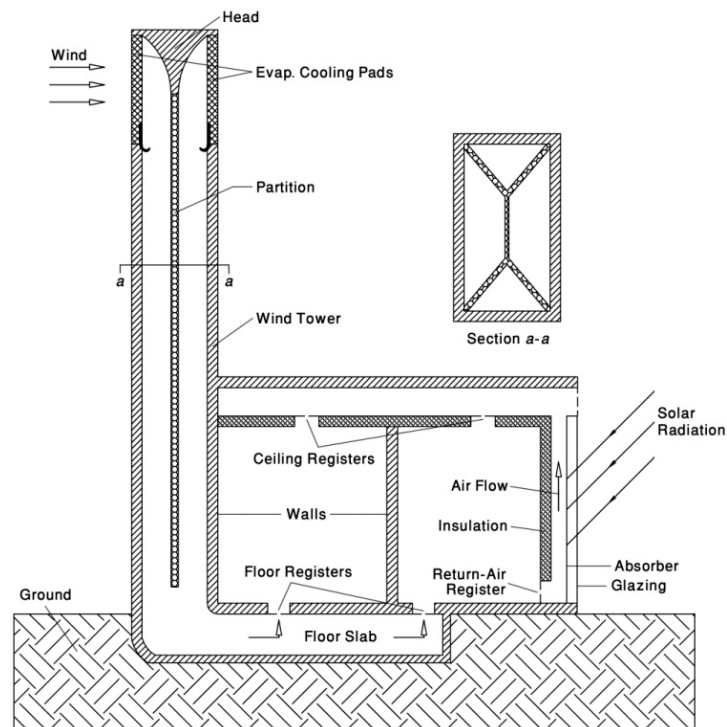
Cross-sectional view of a wind tower with wetted surfaces combined with a solar chimney [26].
